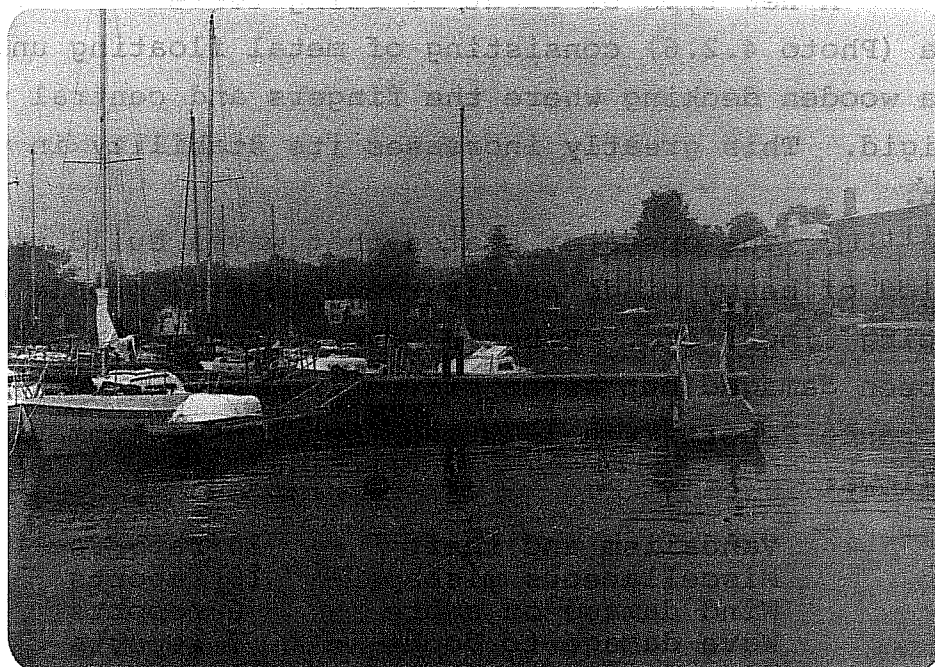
At Portsmouth Olympic Harbour, boats are moored to the concrete walkway and to stern anchors but not to floating fingers.
